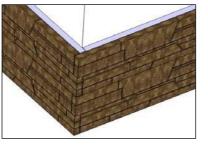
External corners with STONEPANEL/STONEPANEL SKY continuity - preformed corners
